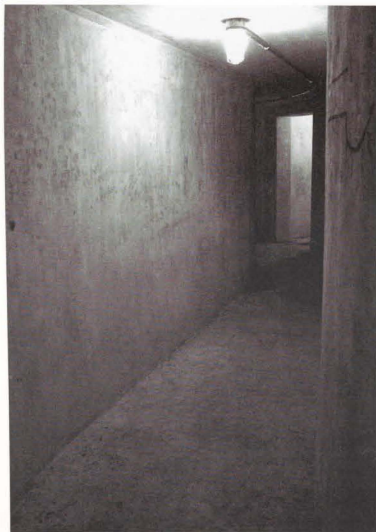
(Above) Longer angle of Photo 13 showing recently installed lighting.
